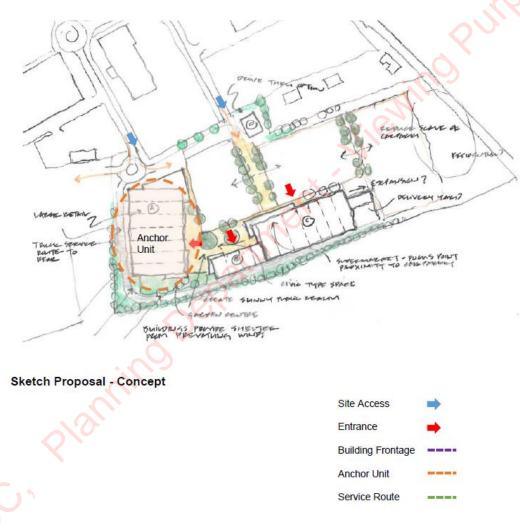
Initial Concept Design for the Proposed Development (Source: M1 Retail Park Design Statement, MCA Architects 2022)
